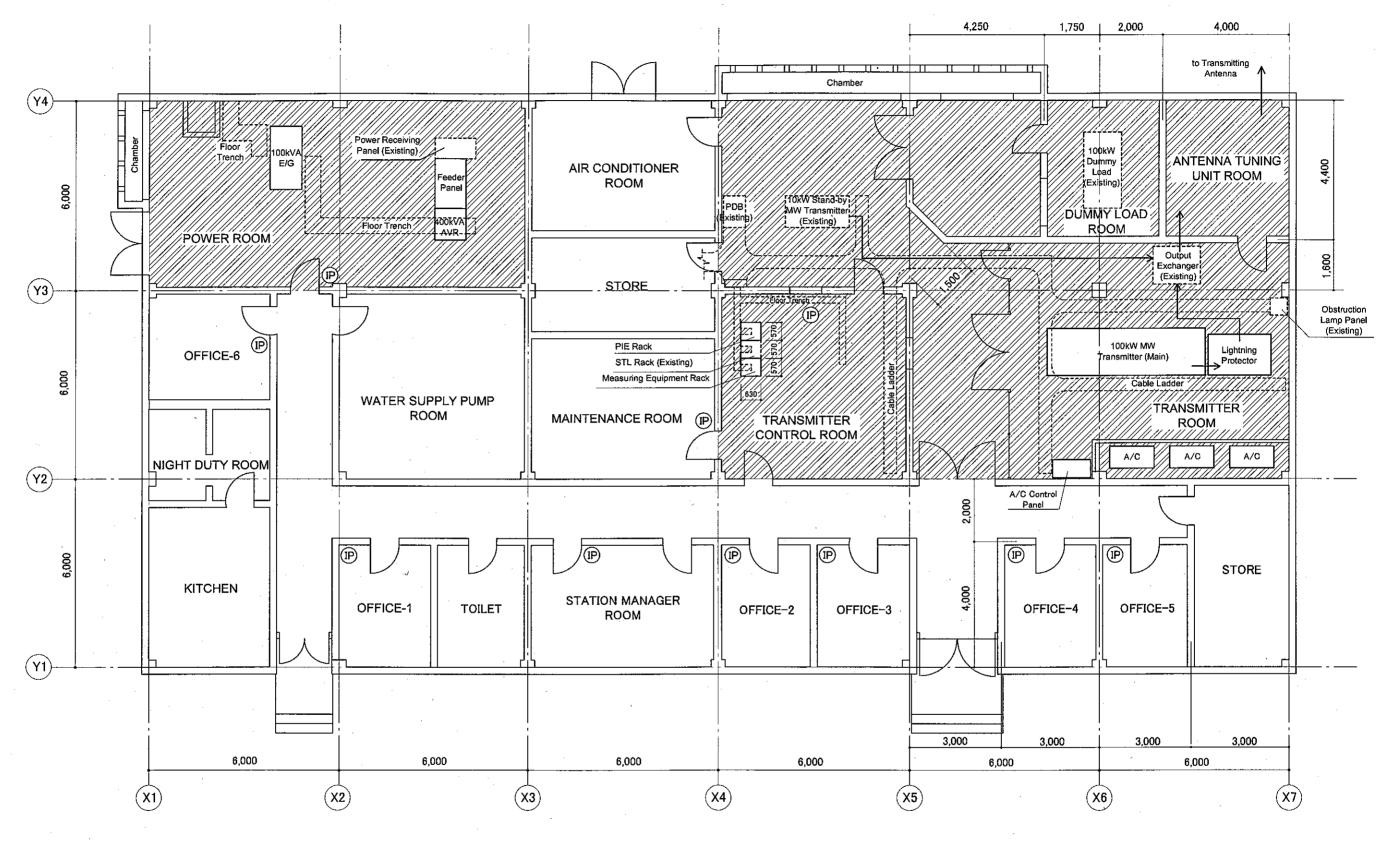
BHAINSEPATI 100kW MW TRANSMITTING STATION EQUIPMENT LAYOUT
